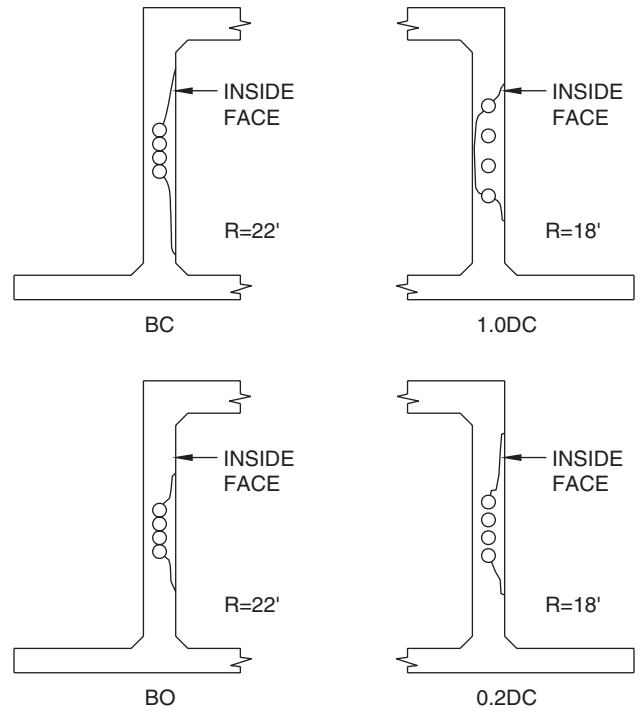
Specimen failure plans (from Van Landuyt, 1991).
